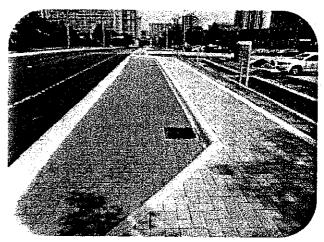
Elm Drive Green Street Pilot Project (Credit Valley Conservation Authority, 2010)
